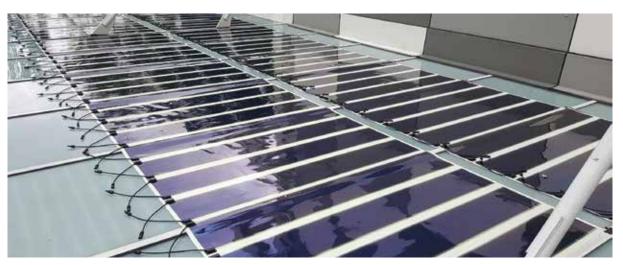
Cleantech 2 building façade where HeliaFilm® has been installed on the roof and façade
